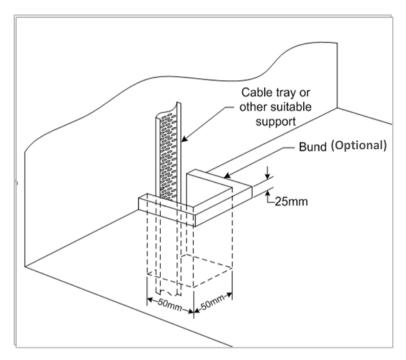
Slot example telecommunications riser/closet floor or ceiling entry
